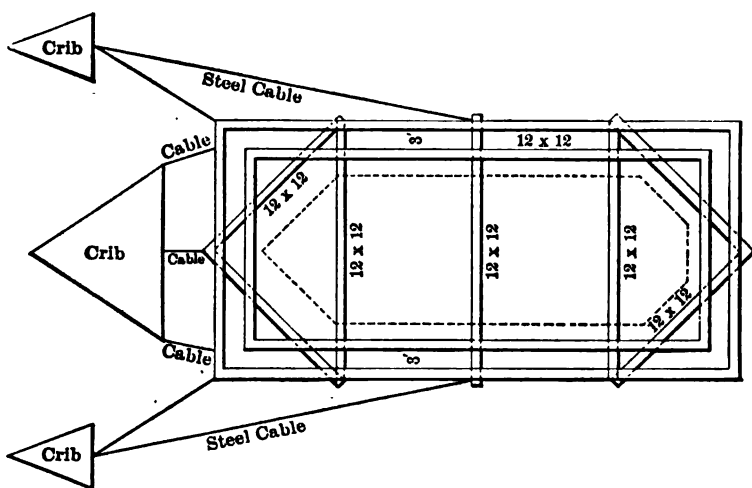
CRIBS FOR ANCHORING ST. LOUIS COFFER-DAM.
